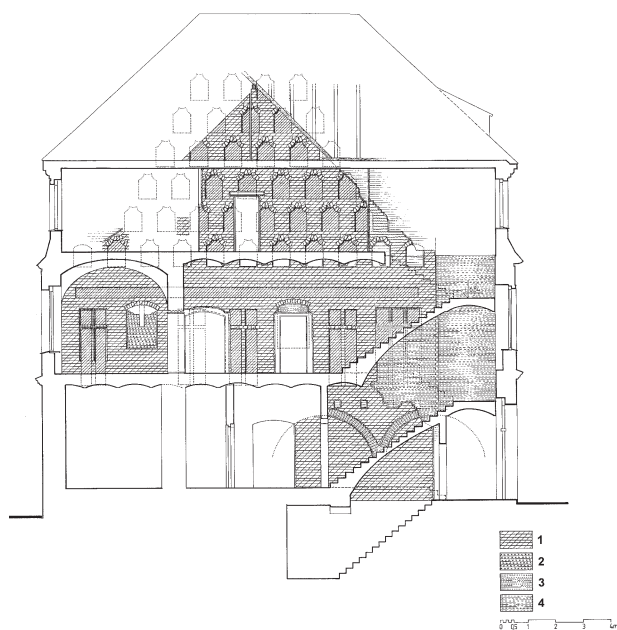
The north elevation with part of gable of the building of the town hall: 1) wall from the 15th century, 2) wall from the 1540s, 3) wall from the last third of the 17th century, 4) wall from 1885–1888 (by J. Burnita, C. Lasota, A. Legendziewicz)
